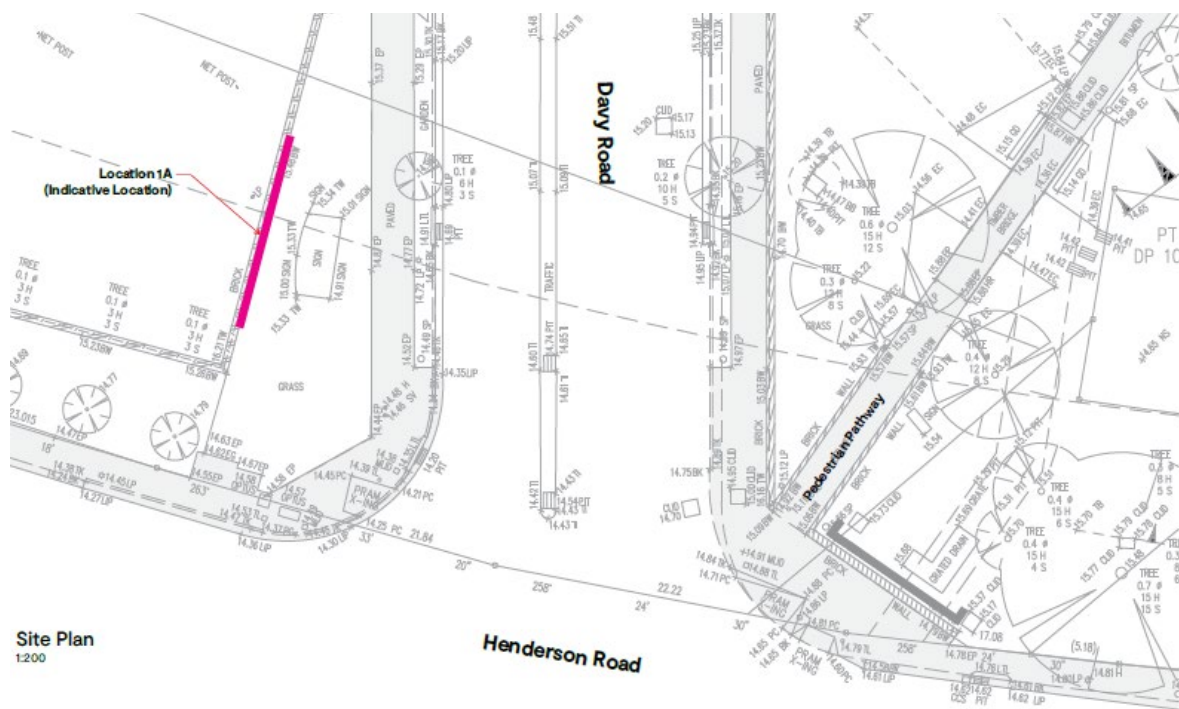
Site Plan – Location 1A (Source: Mirvac, Diadem and Buchan, 2020)
